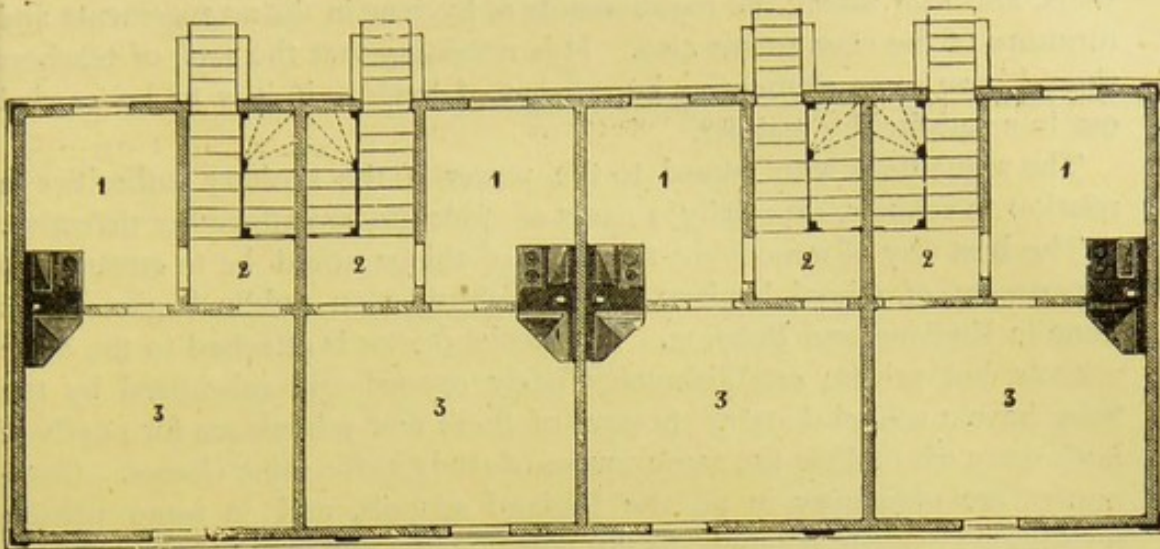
PLAN OF A HOUSE WITH FOUR TENEMENTS.
